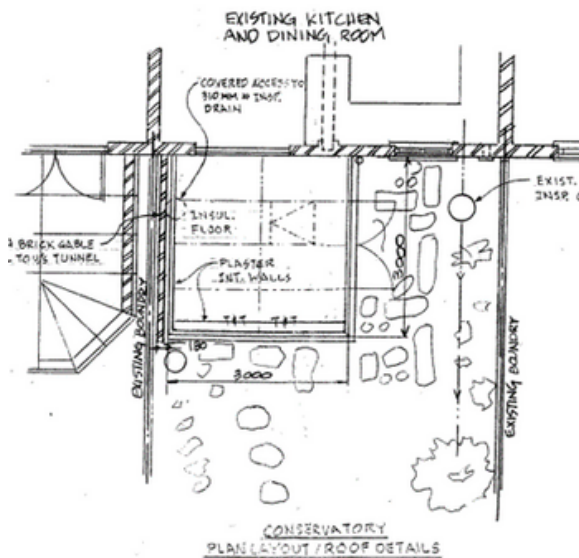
Floor plan of the neighbour adjacent to 8 Linden Square
